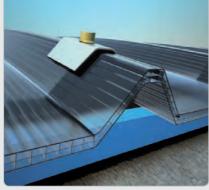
DETAIL OF OVERLAP Detail of double anchor bracket anchored to roofing structure
